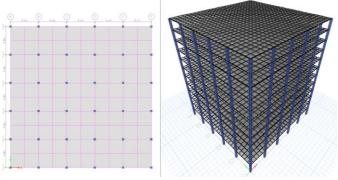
Rectangular Shape building with Flat Slab without drop panel
